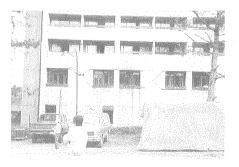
Typical shear cracks on exterior walls of Hyatt's West building
